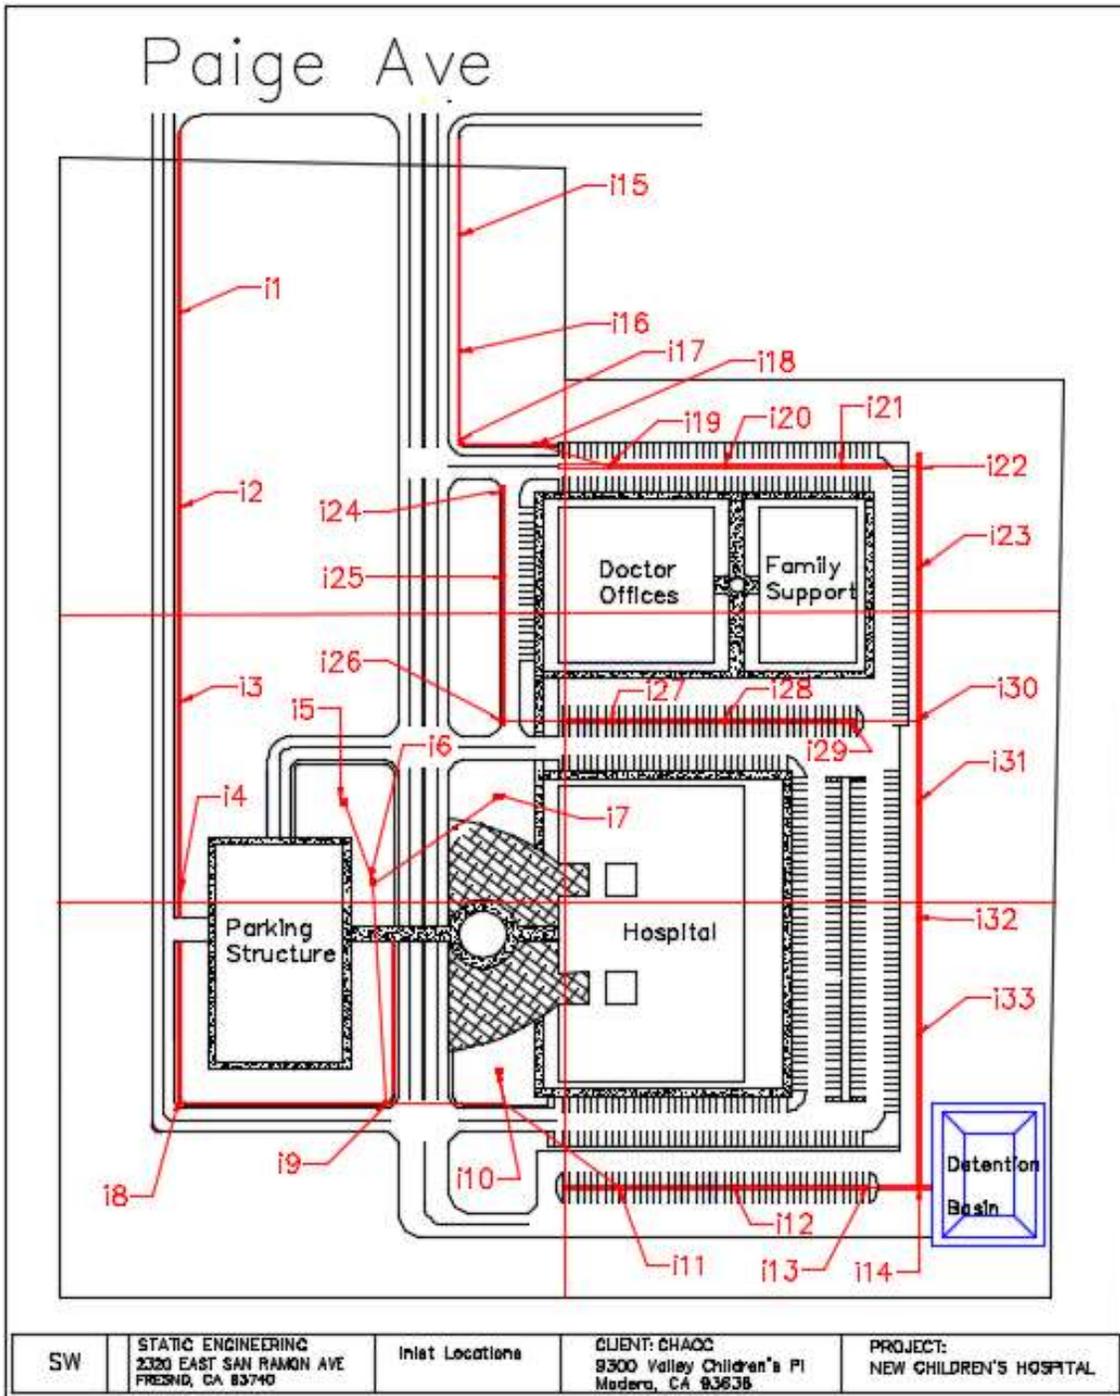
Location of planned, inlets, detention pond and storm sewer pipes
